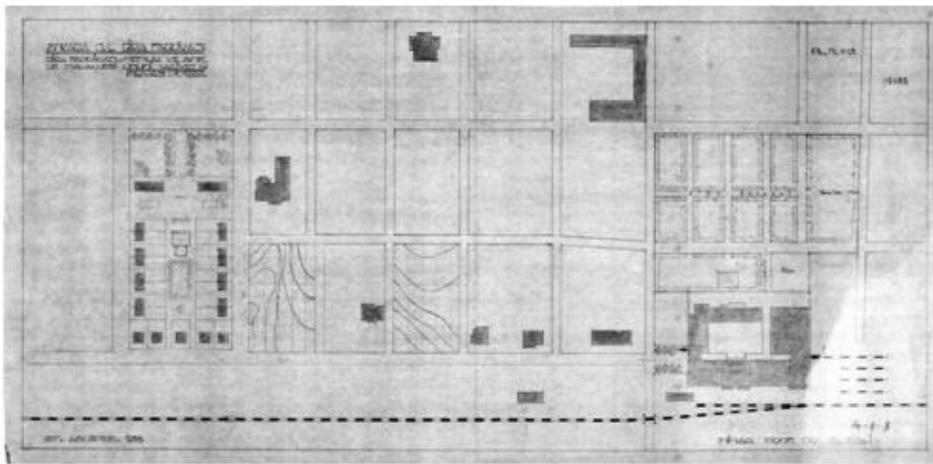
1936 AFF Brewery Workers Houses Draft Site Plan
